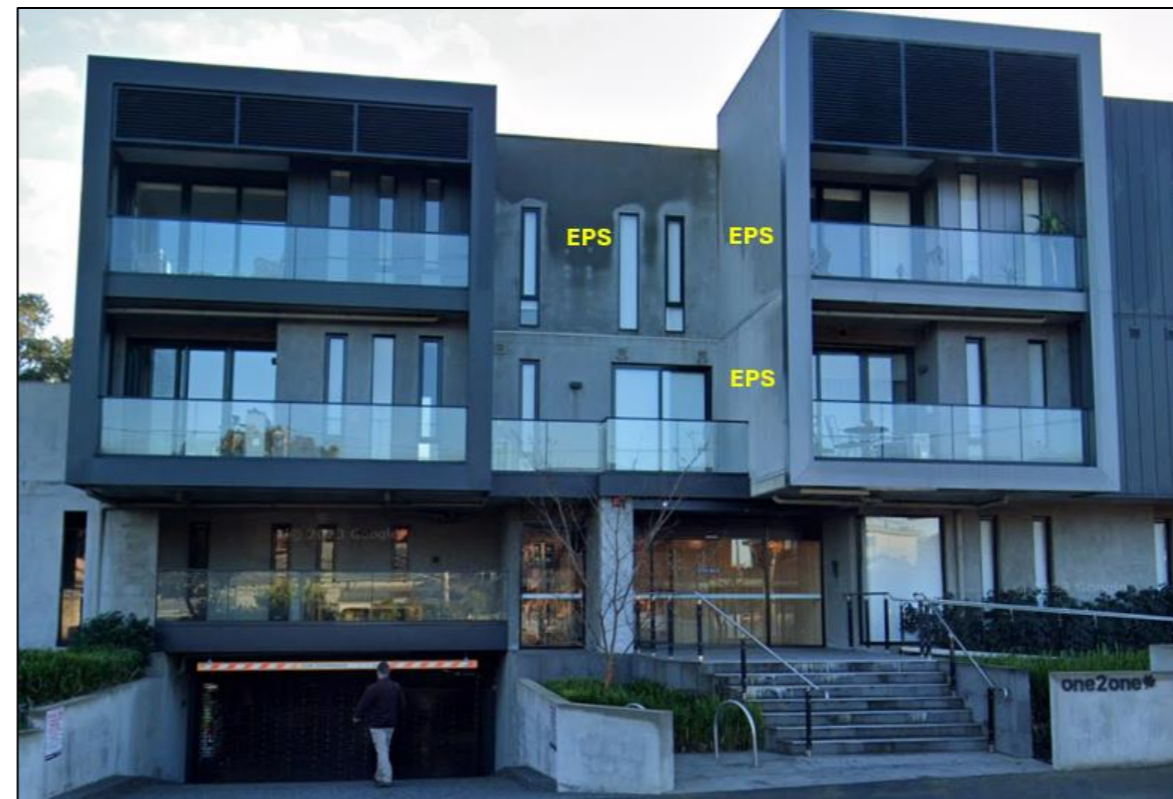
EPS on L1 and L2 on external walls to side and behind the main entry/exit. Sprinkler protection to SOUs.
